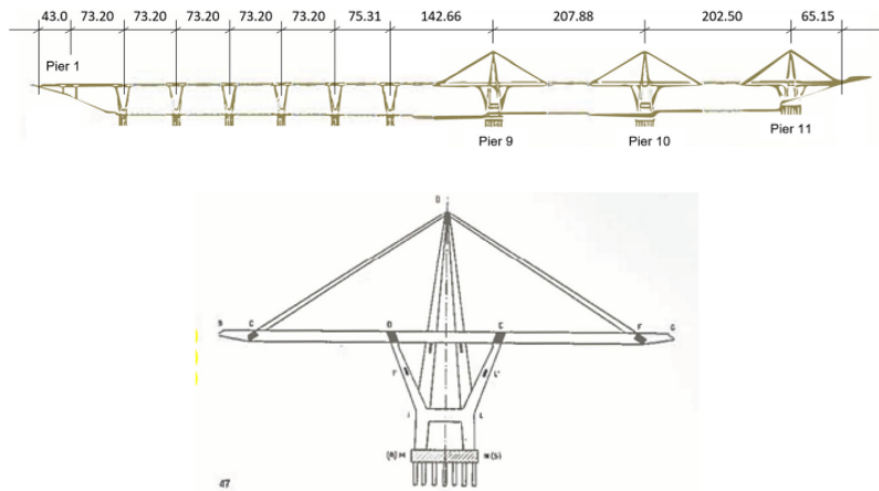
Polcevera Viaduct Layout and Pier 9 detail
